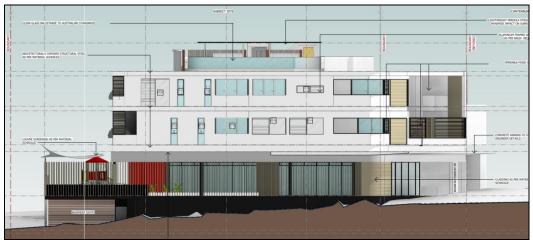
Southern (Watkin Street) elevation of proposal showing slope of land.
